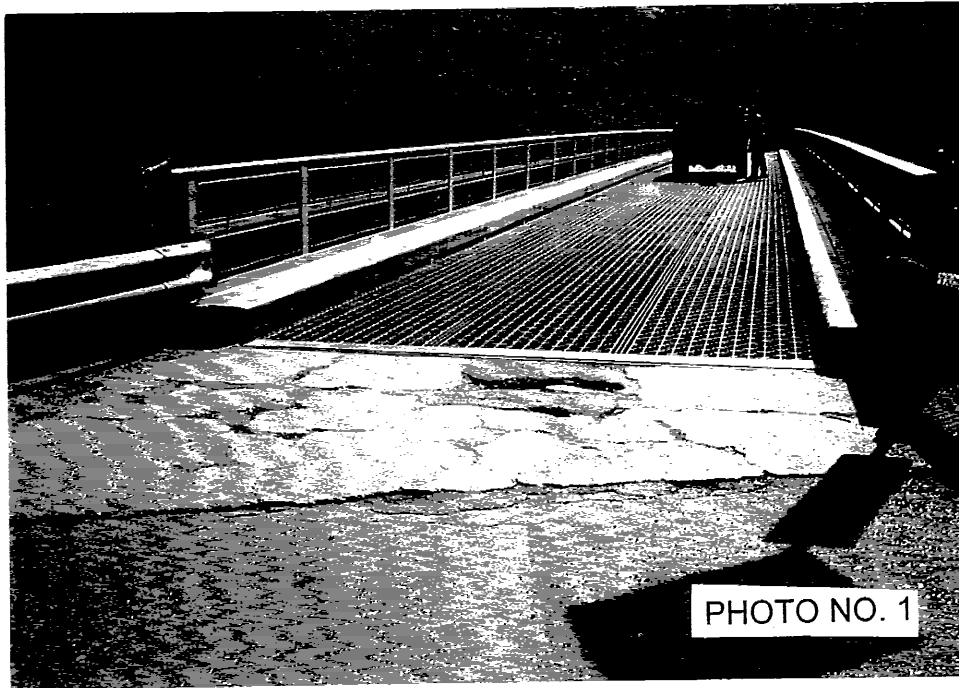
East Approach; Note extensive deterioration of approach slab.
